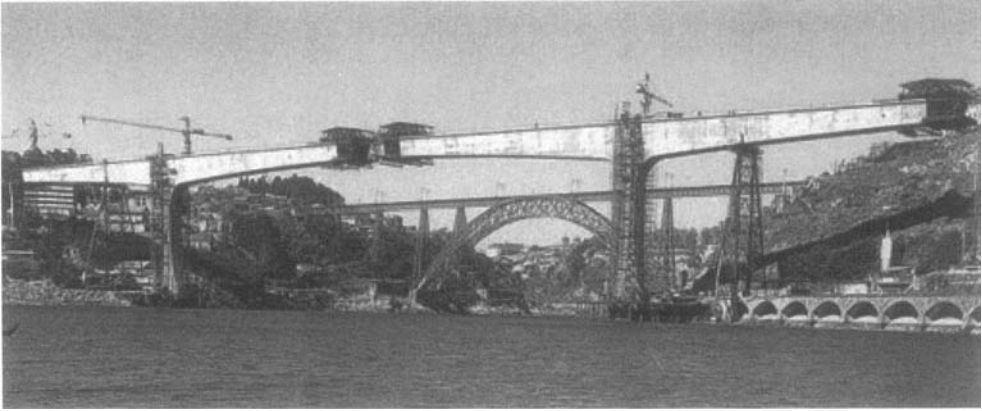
S. João Bridge in Porto, Portugal, during construction
